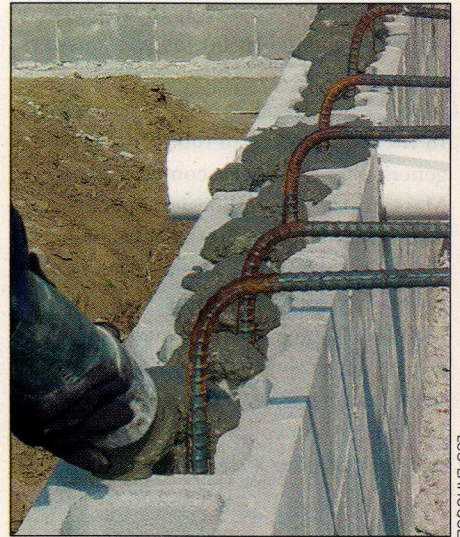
In termite-infested locations, every core in any block wall should be fully grouted.
